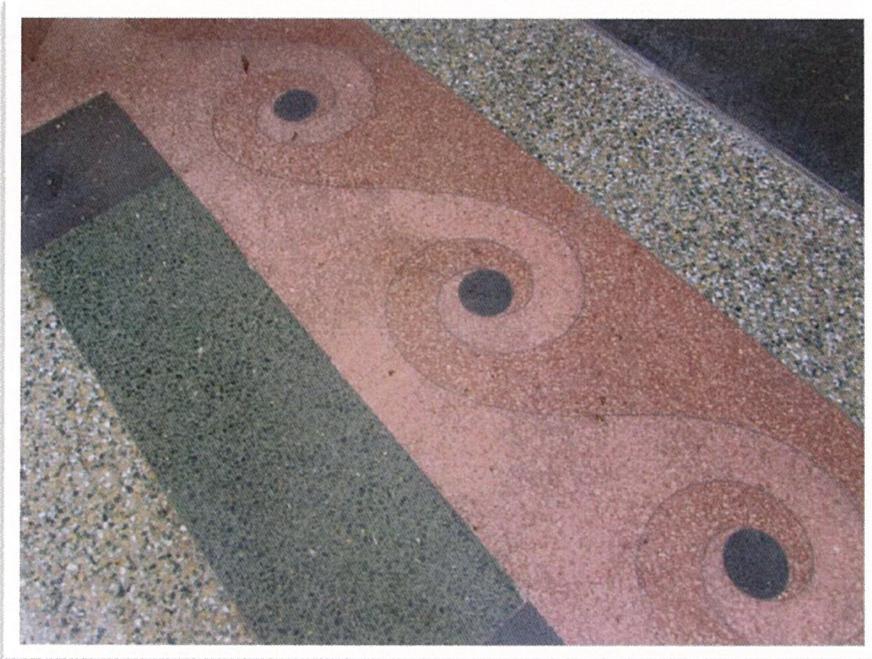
Terrazzo detail at rear terrace patio off west elevation
